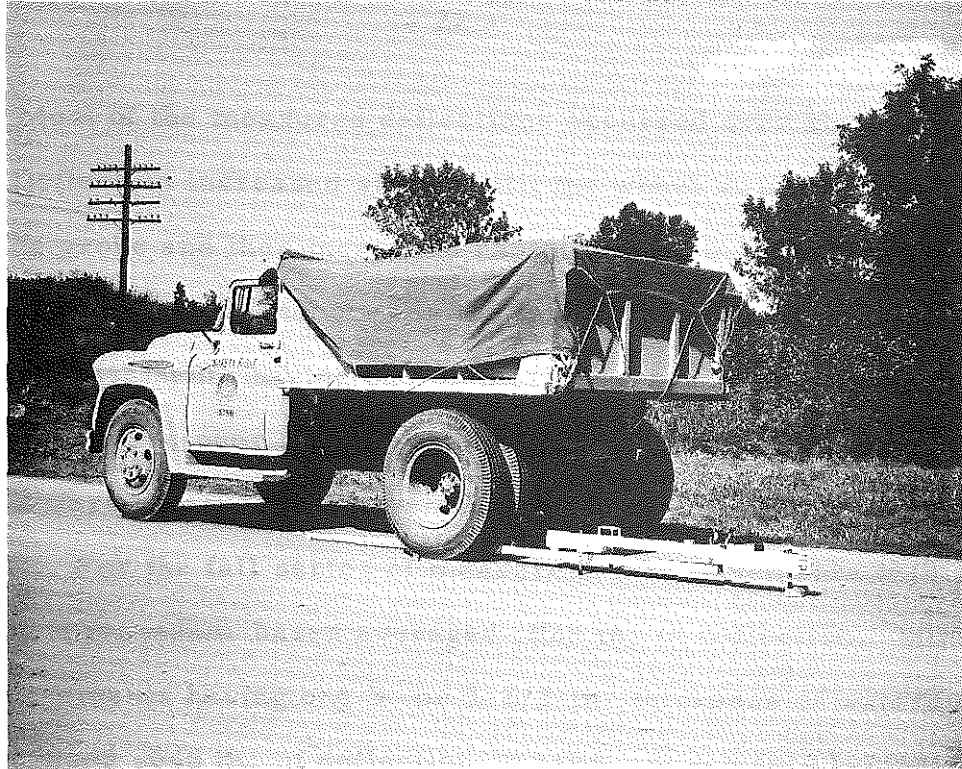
Photograph Showing Benkelman Beam In-Place for Measuring Pavement Deflection Under 18,000-Lb. Single Axle.
